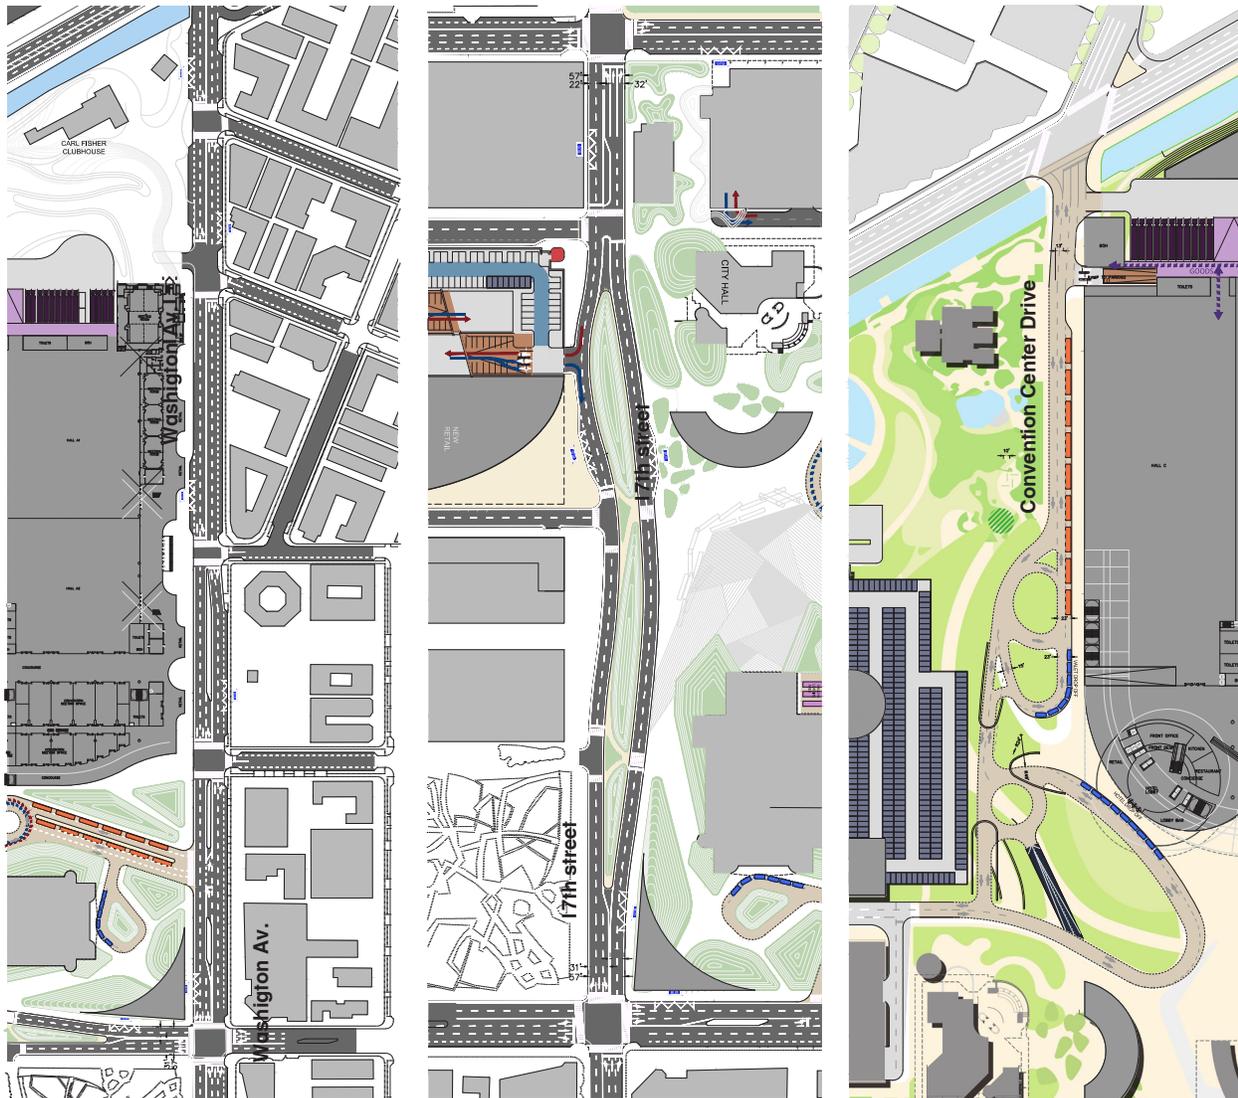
Excerpts of the road layout plan showing ameliorments proposed for Washington Av., 17th street and Convention Center Dr.
